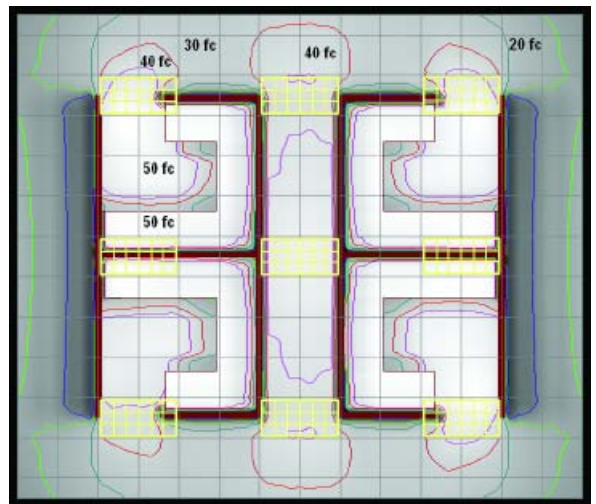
2 x 4 Symmetric Horizontal Lighting Plan
